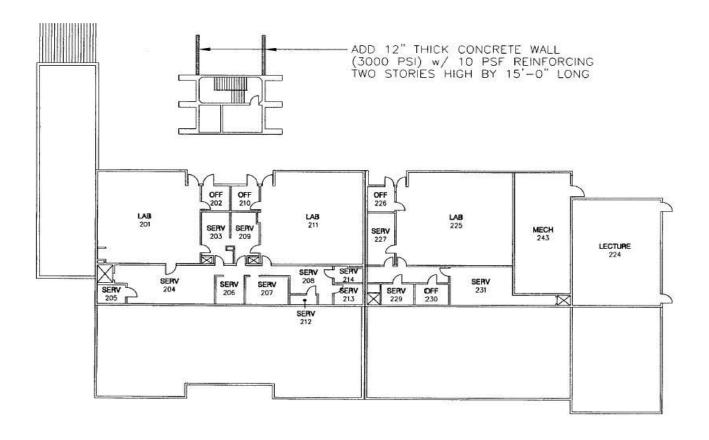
PROPOSED ADDITIONAL WALL LOCATION
